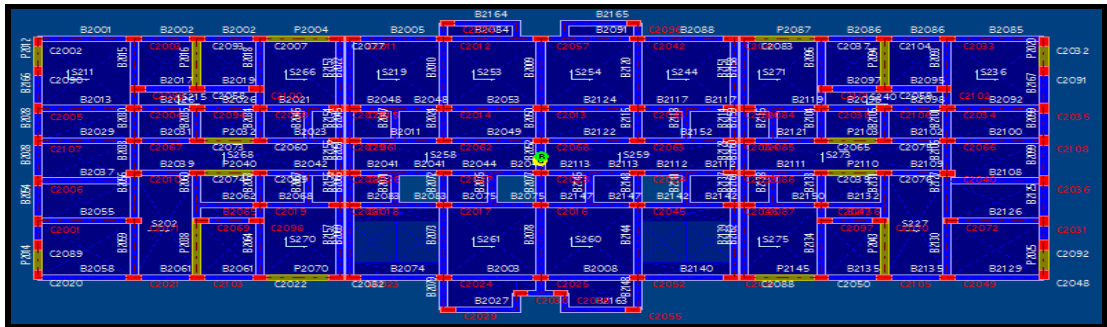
Plan of Twenty Eight Stories and Coupled Shear Wall System
